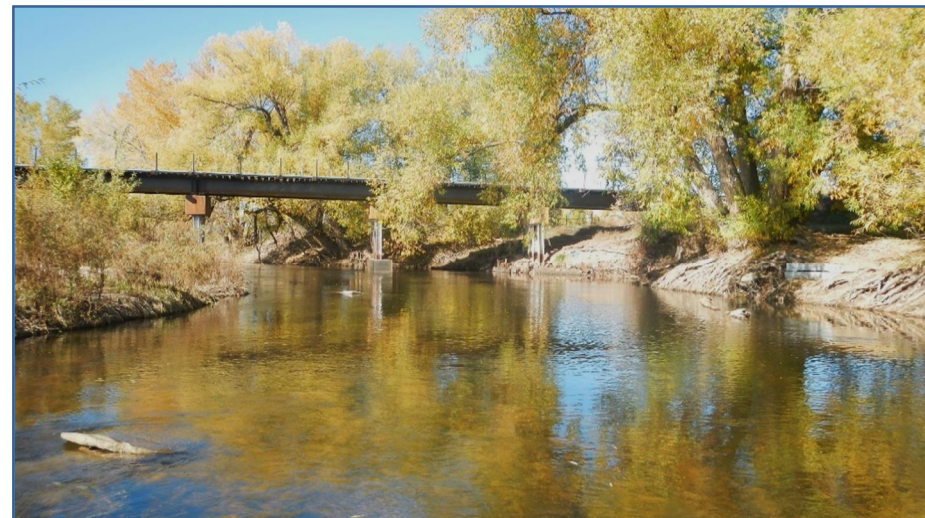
Poudre River Looking Northwest at the Burlington Northern-Santa Fe Railroad Bridge
